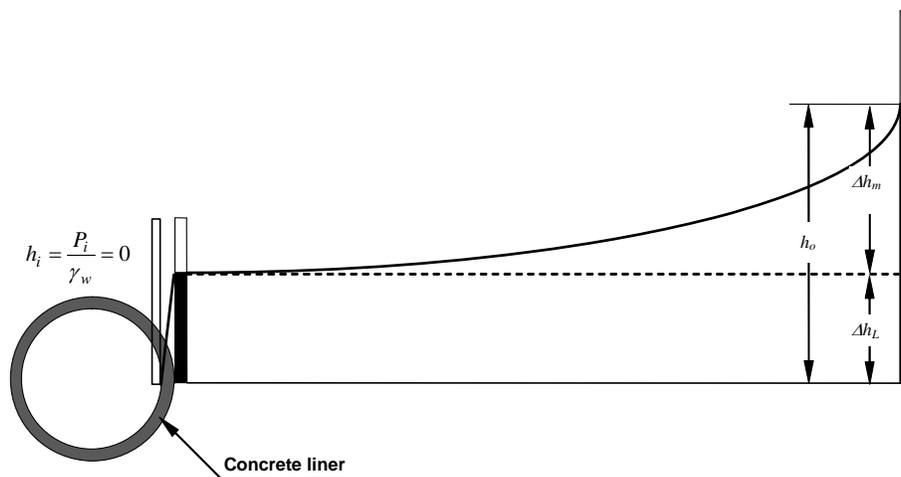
Head Loss across the Lining and Surrounding Ground
